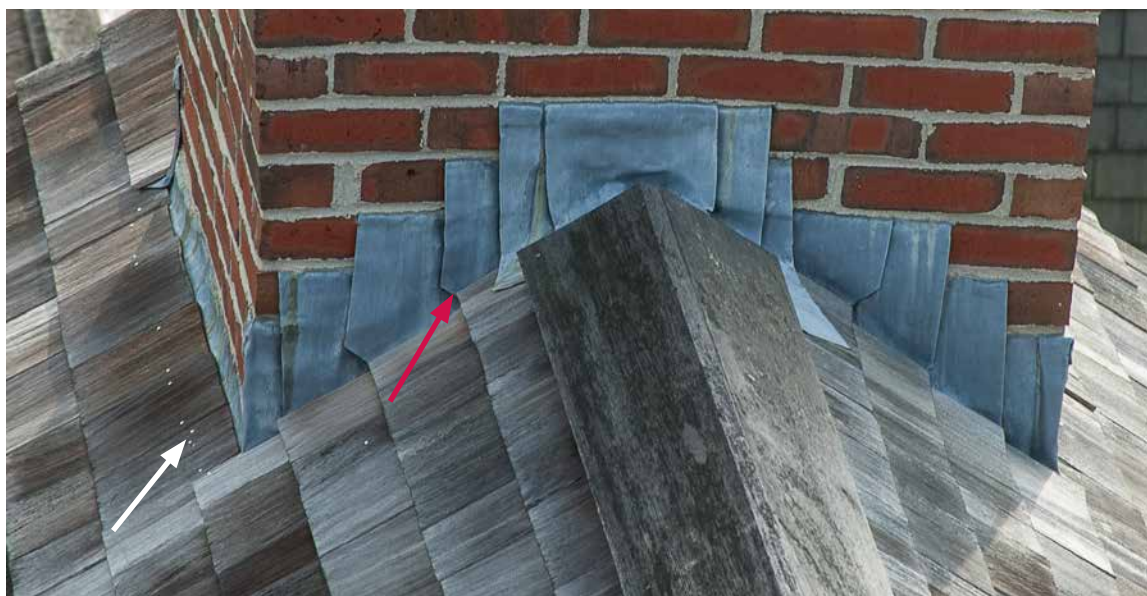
Photo taken in 2006 showing the flashing at the rear ell chimney. The white arrow points to face nailing through shingles placed over the apron flashing, which is a problem as discussed at Photo 17. The red arrow points to the lead step flashings that appear to be done as a single piece extending under the shingles. The preferred method is to install two piece flashings consisting of a base flashing and separate counter flashing that covers the upstand of the base flashing. If these lead flashings remain sound they could be trimmed to properly lap over new copper base flashings when the roof is redone.
